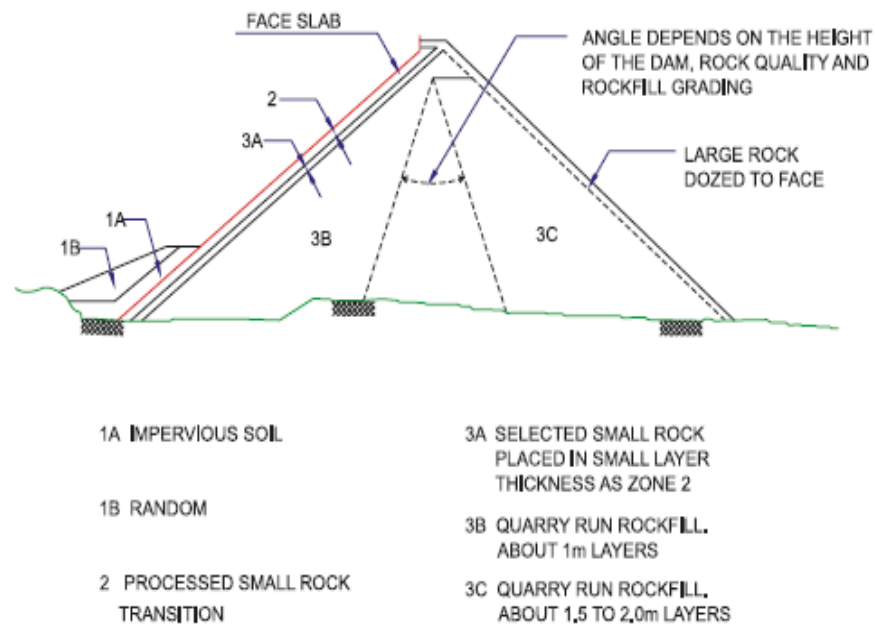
Zone designs for concrete face rockfill dam (Won and Kim 2008)
